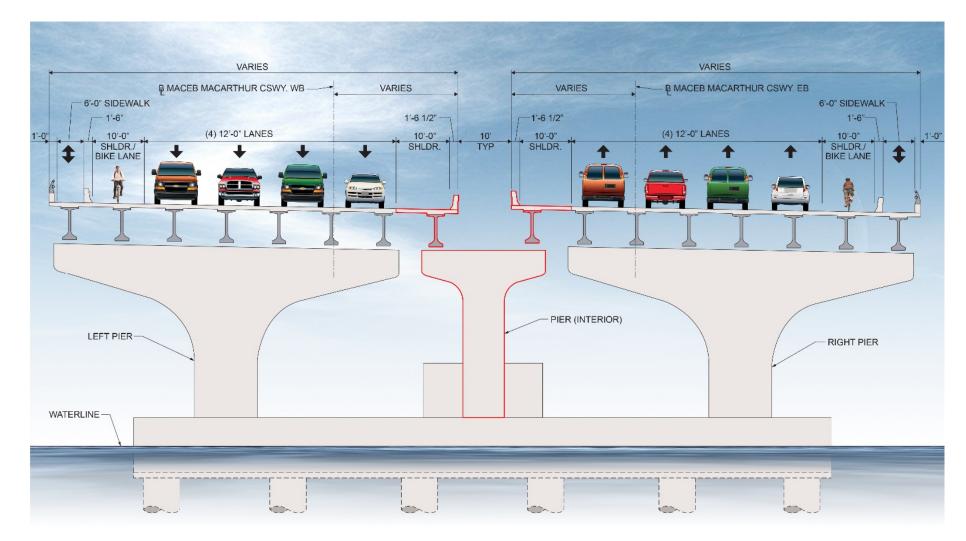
MacArthur Causeway Existing Typical Section (Bridge No. 870771 and No. 870772)
